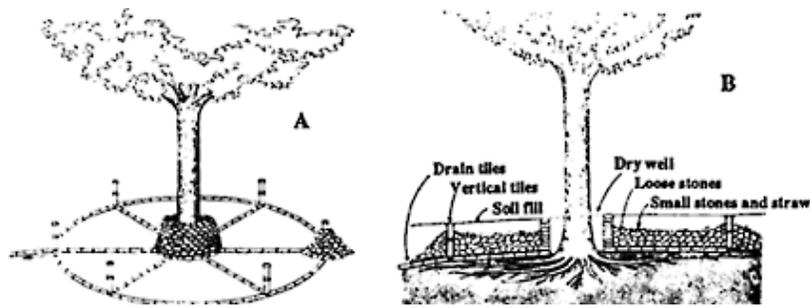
A. Perforated drain tile is laid out on original grade, leading from a stone or cement-block well around the tree's trunk. B. Tiles are covered with coarse gravel and soil to new grade.
